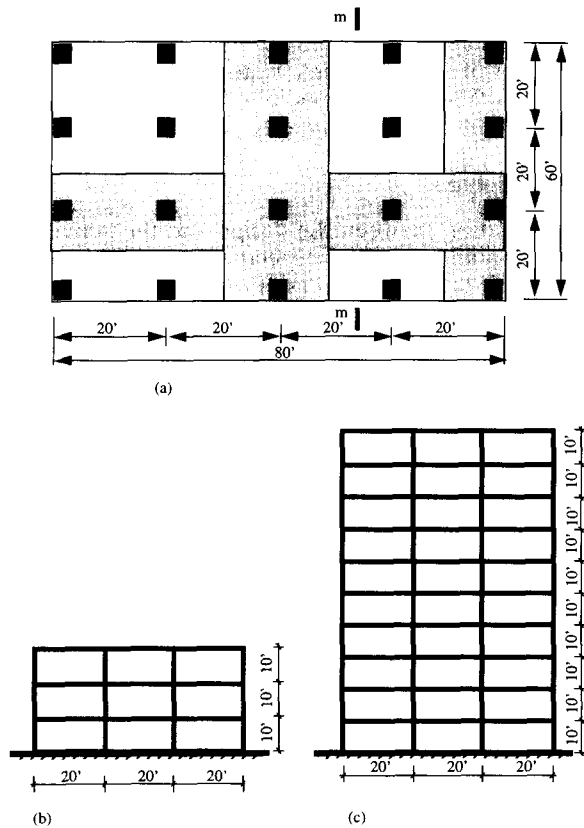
Configuration of Flat-Slab Buildings (1 ft = 304.8 mm): (a) Floor Plan; (b) Elevation of Three-Story Building; (c) Elevation of 10-Story Building
